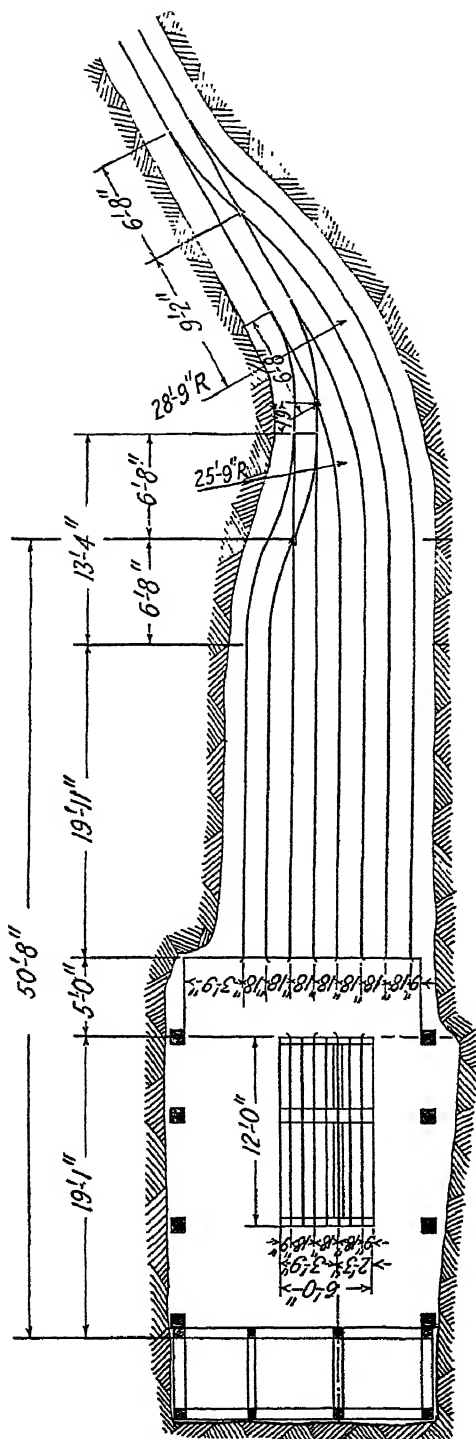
STATION PLAN, BIG JIM THIRD LEVEL.
